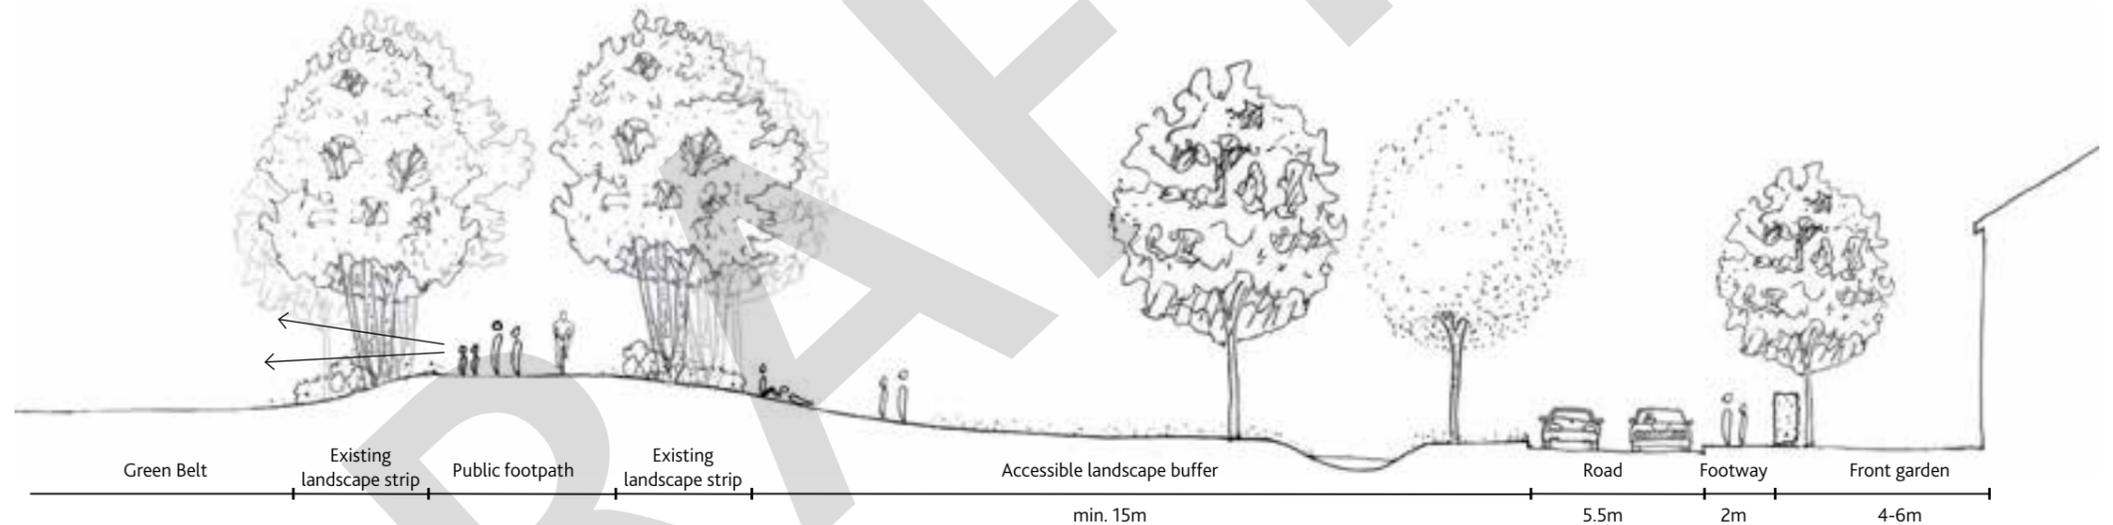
Typical street section 10 - Active Travel Route linking the disused railway line at the north of the site
